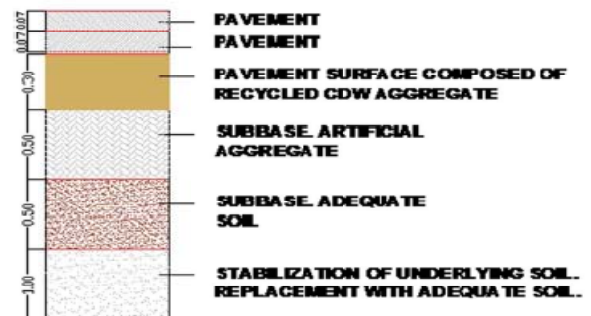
Pavement Section made of Recycled C&D Waste Aggregate
